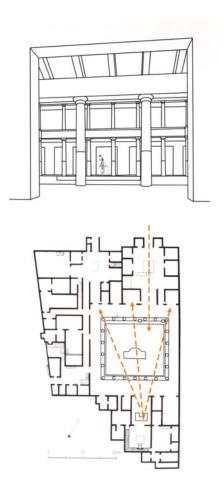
The Plan of the House of the Centenary (adopted from Clarke, 1991, 18)
